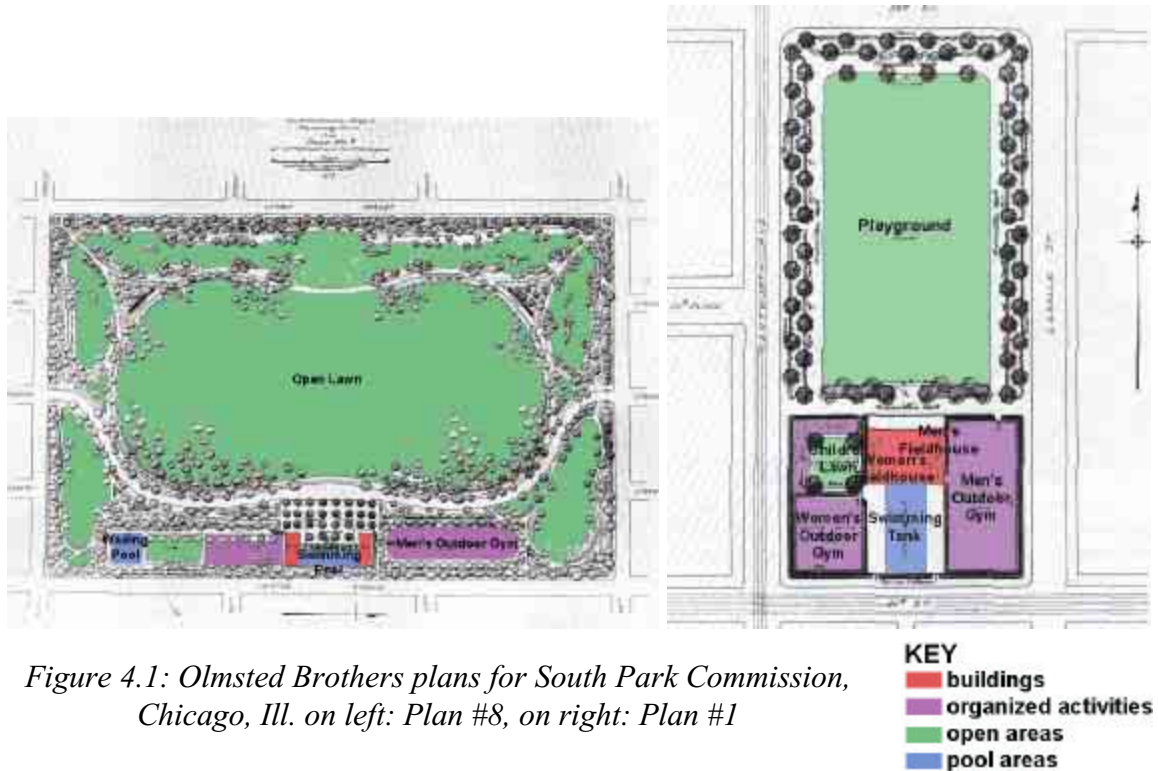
Olmsted Brothers plans for South Park Commission, Chicago, Ill. on left: Plan #8, on right: Plan #1
